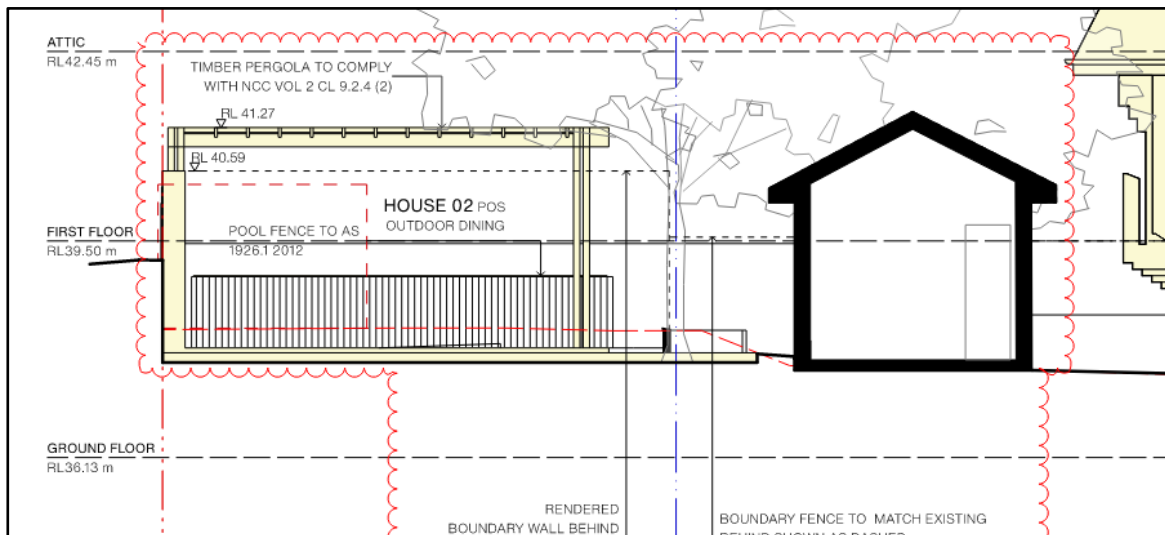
Demolition of existing carport wall (shown in red) and construction of pergola wall and structure (Source: Tribe Studios)
